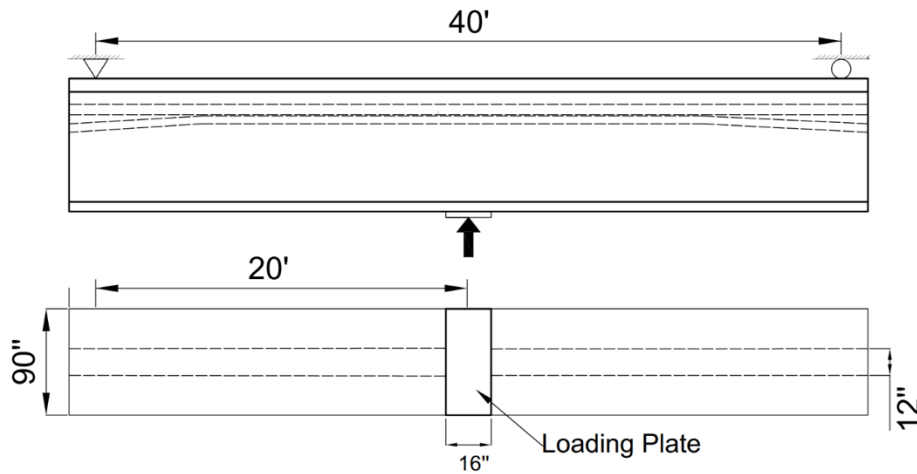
Elevation and plan view of girder specimen considered in parametric study
